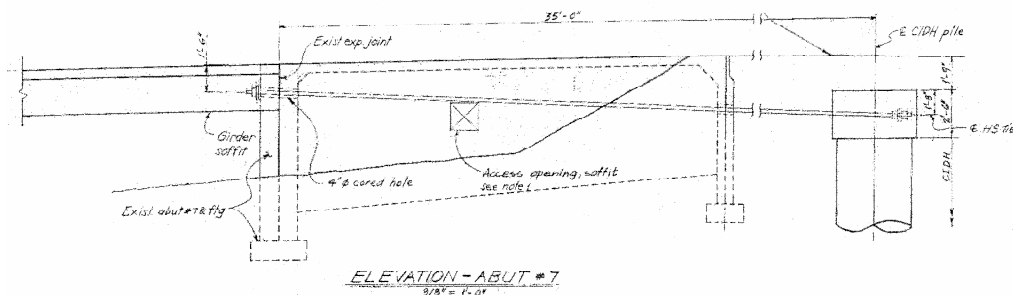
Typical Abutment Retrofit Detail (PB, 1993).
